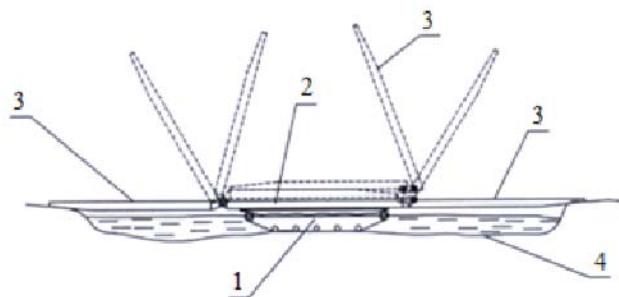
1 – Vehicle; 2 – Fixed span of a bridge; 3 – Opening spans; 4 – Obstacle
